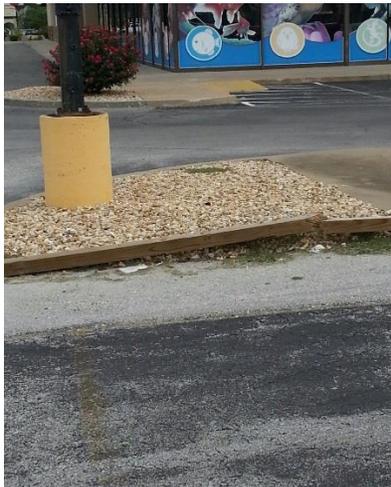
In addition to several others, these photos provide a sampling of locations damaged and missing curbing.
